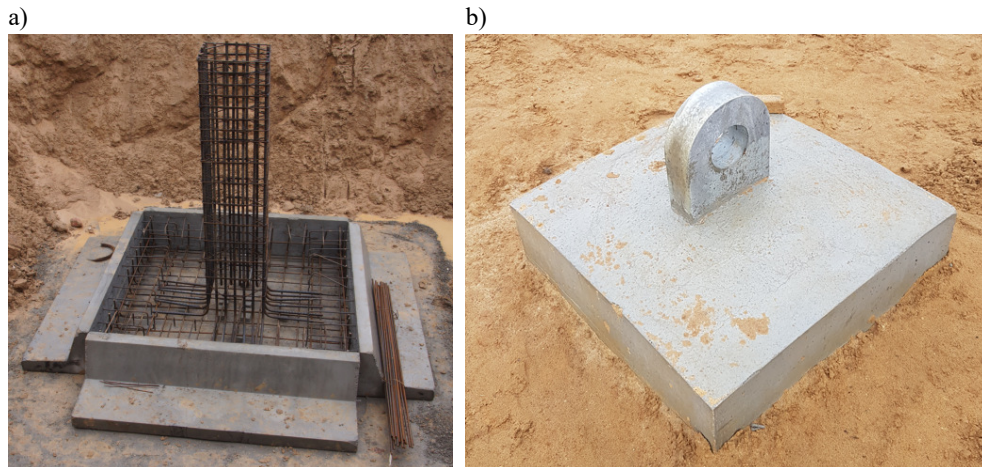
View of the test foundation: a) precast base slab and shaft reinforcement, b) foundation head with anchor (Enprom Report, 2018)
